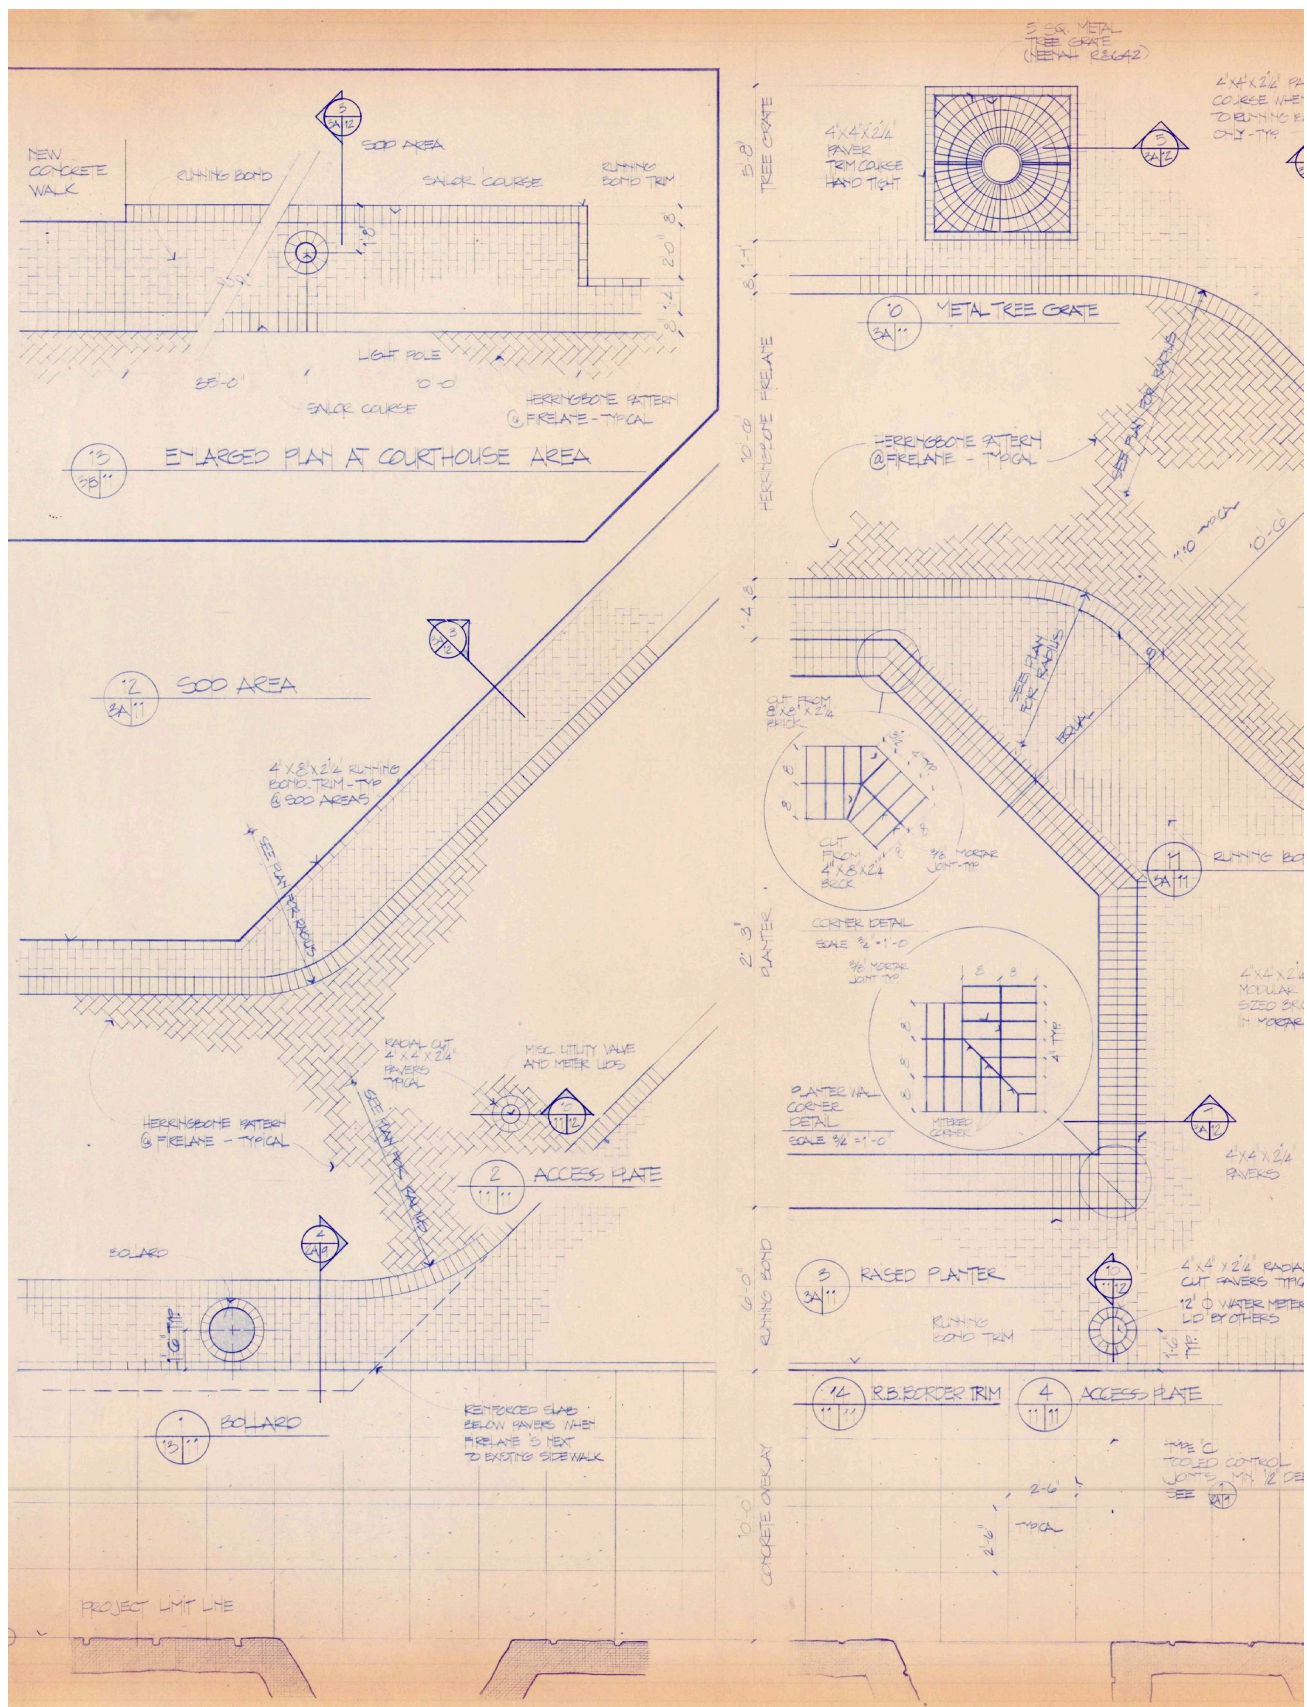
Pearl Street Mall construction documents brick paving plan, 1976 (source: City of Boulder)
